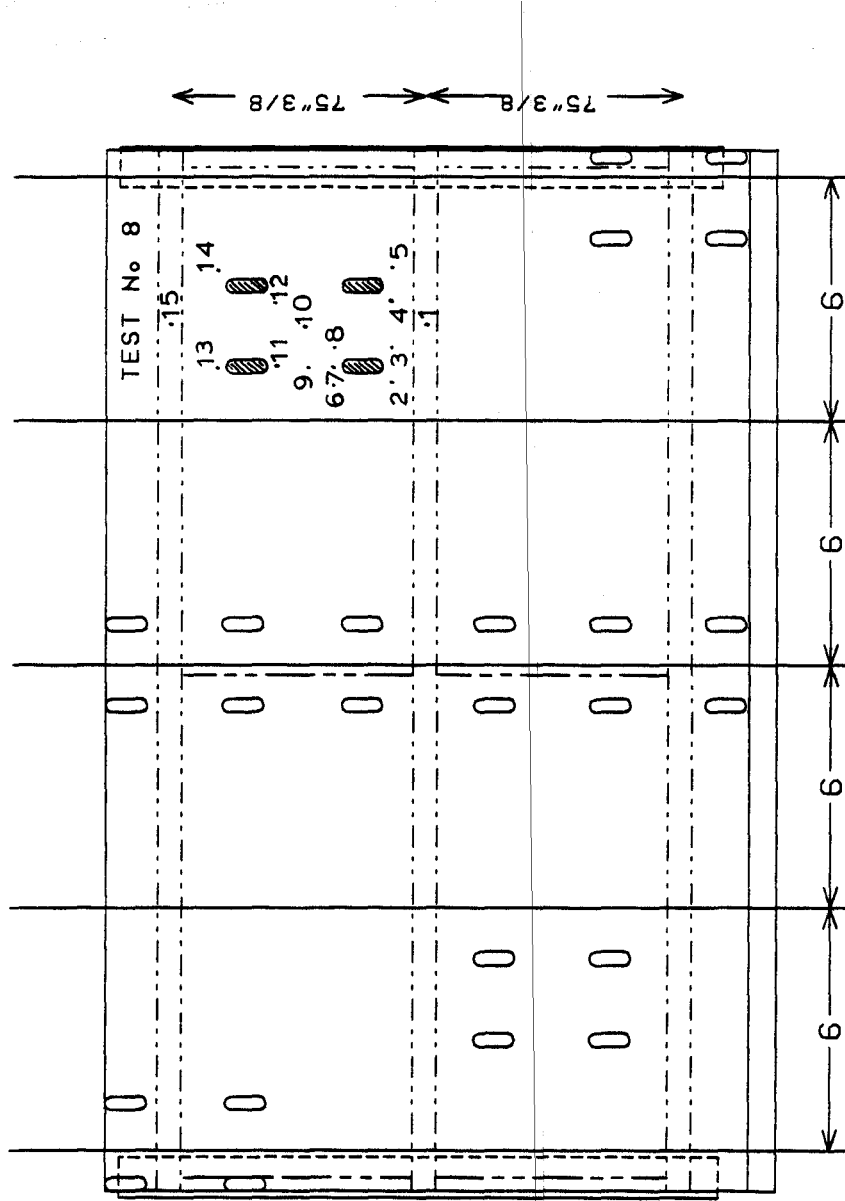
LVDT Locations (Second Bridge - Test No. 8)
